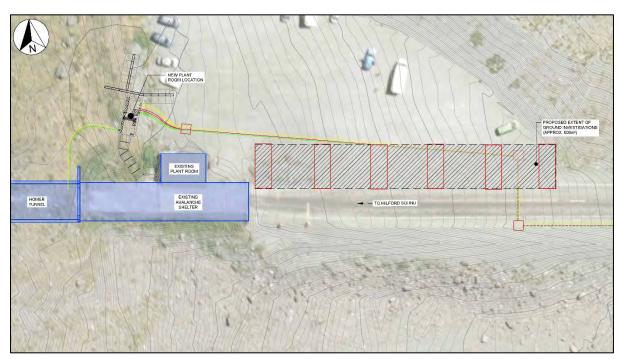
Design drawing showing the proposed exploratory excavation area (hatched in black, not to scale).⁶⁰
